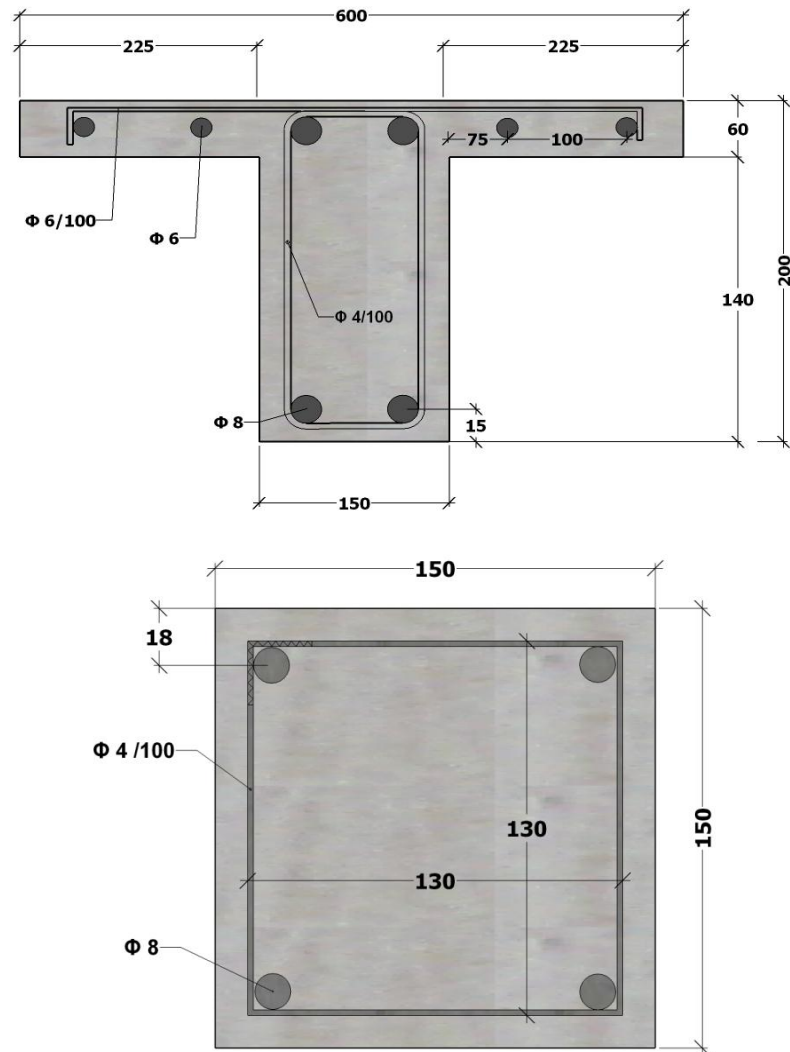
Reinforcement details of columns and beams (All dimensions in mm)
